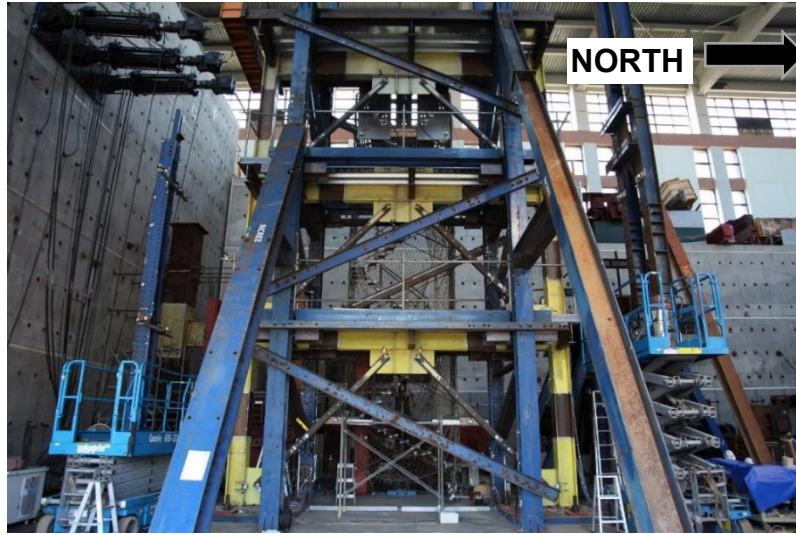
Photo of test specimen with out-of-plane frame (in blue)
